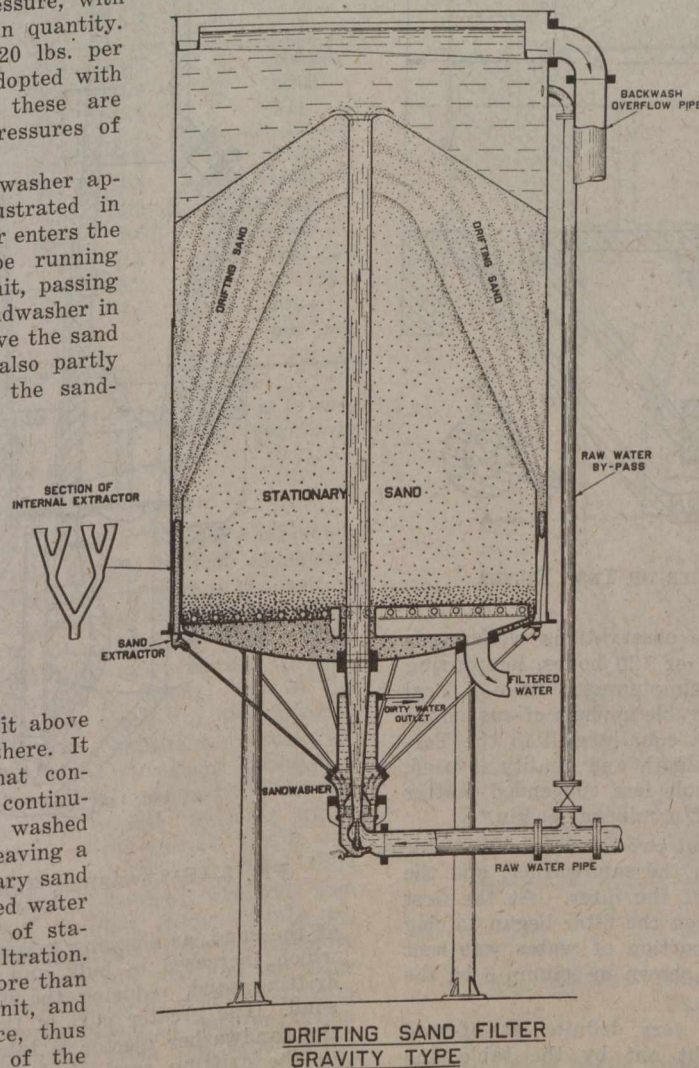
TYPICAL SINGLE UNIT DRIFTING SAND FILTER
